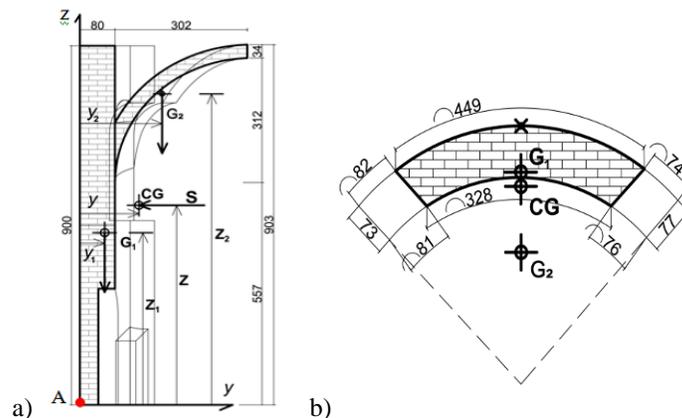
Failure block no. 4; a) vertical section b) in plan dimensions and positions of centres of gravity
